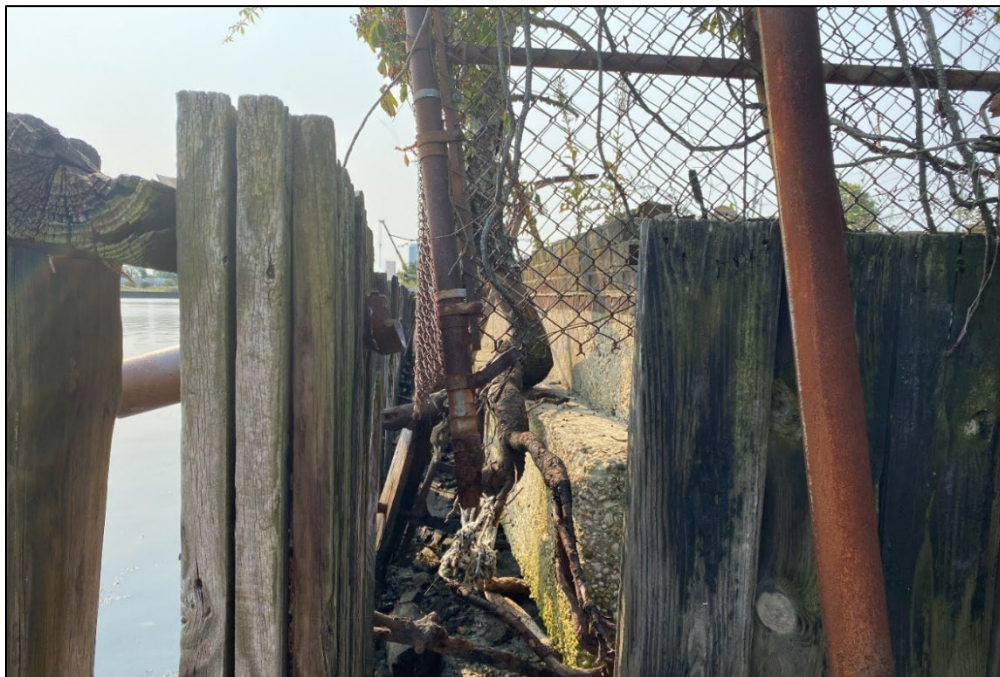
Close up of bulkhead in disrepair, showing thick concrete foundation pad and remains of a brick wall.
